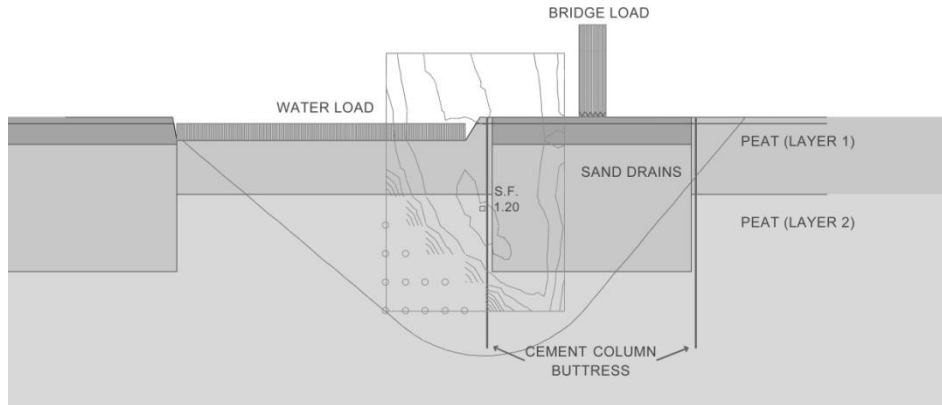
Critical sliding surface for slope stability failure of the foundation region
